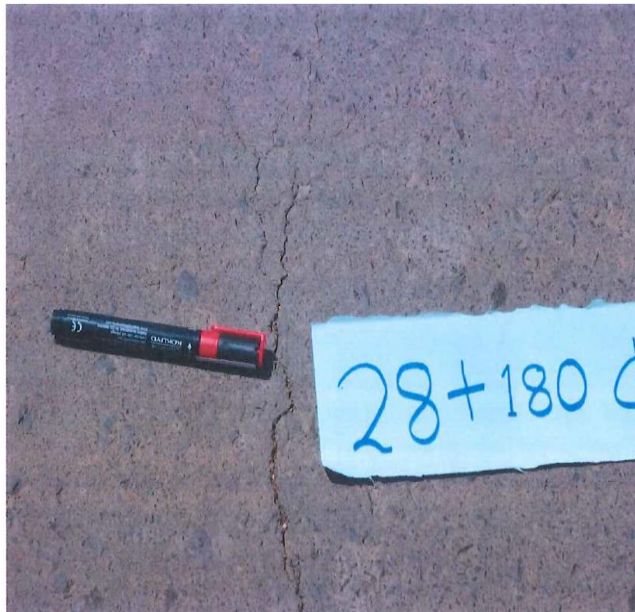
Longitudinal reflective crack in surfacing - Sigalagala-Butere Road (Source: Author, 2015)
